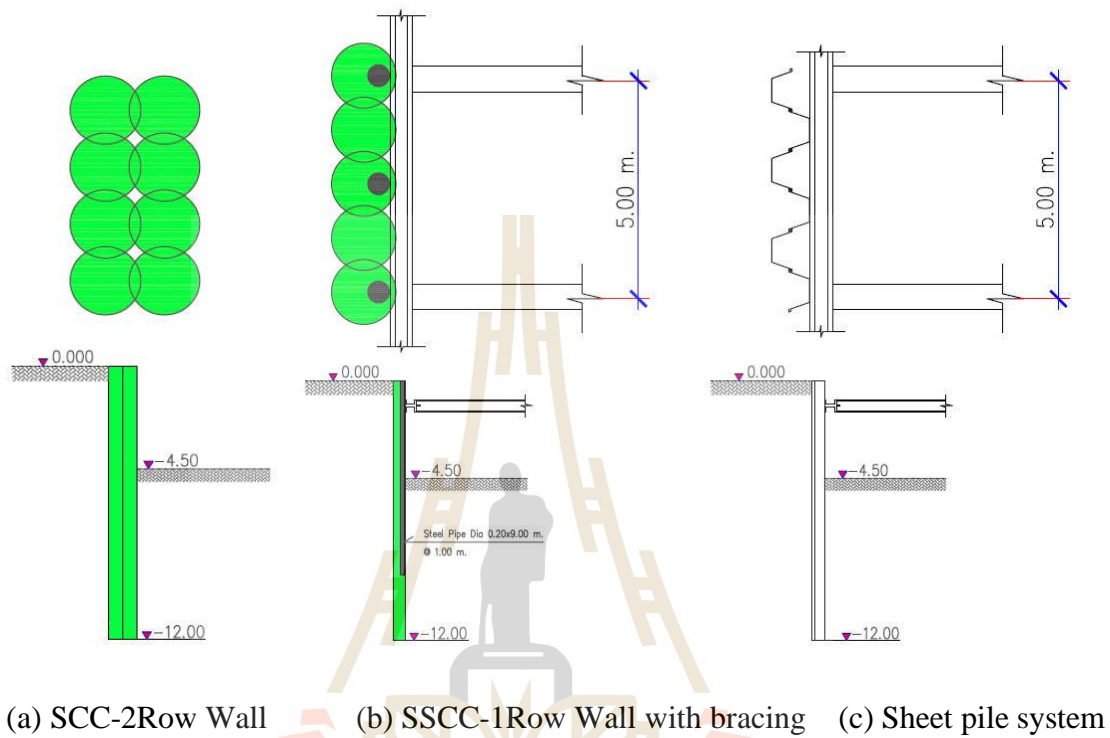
Layout and section of retaining wall: a) SCC-2Row, b) SSCC-1Row with bracing, and c) sheet pile.
